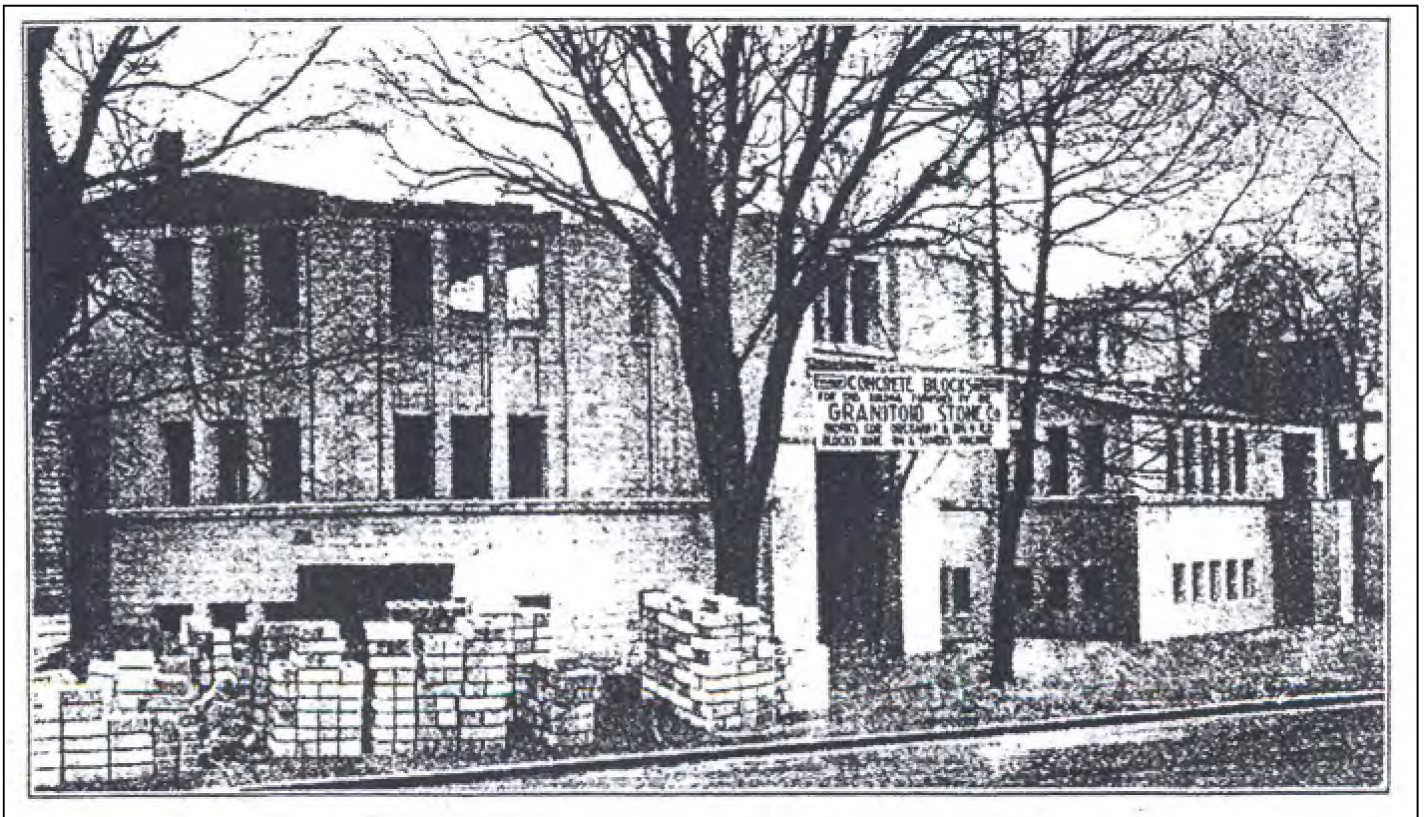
First Christian Church under construction, 1910. Banner above tower entry advertises the Granitoid Stone Company
